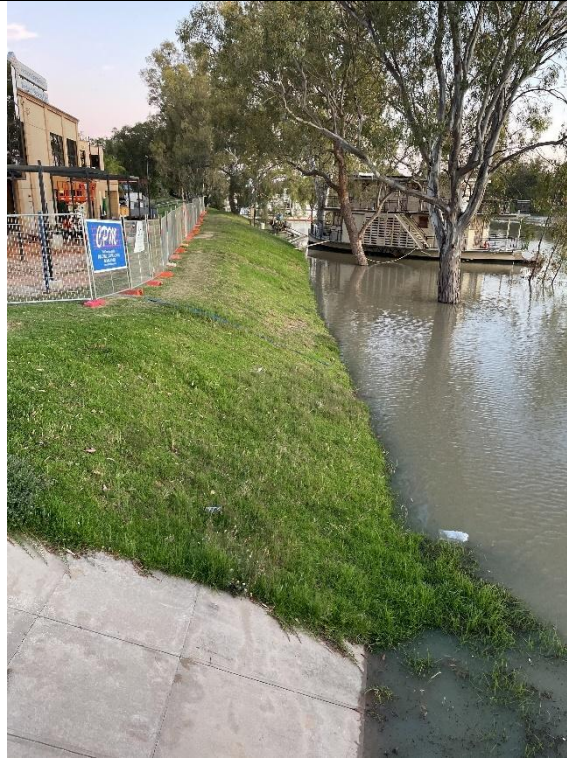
Looking north along the western Wentworth levee near the western side of Liftspan Bridge
